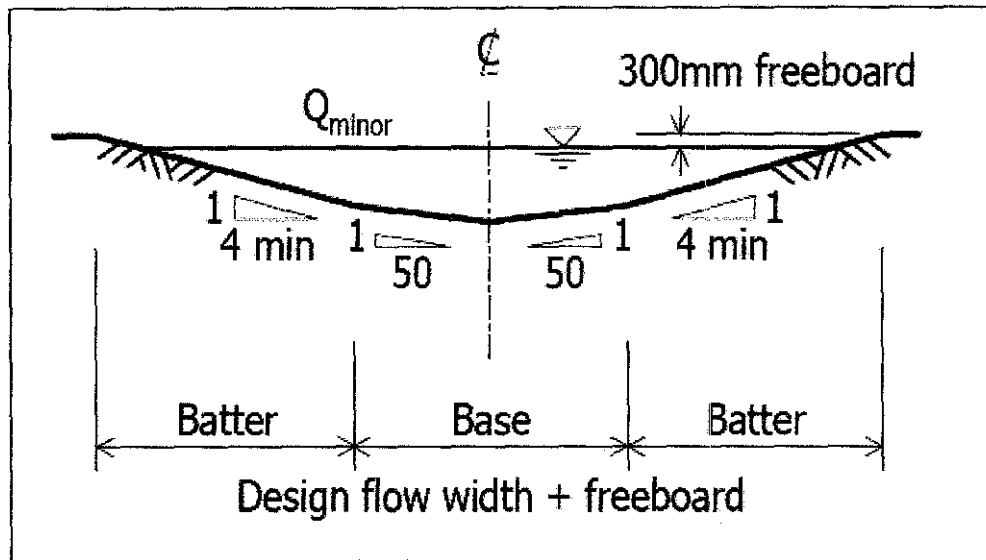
Recommended grassed swale cross section (trapezoidal shape)
